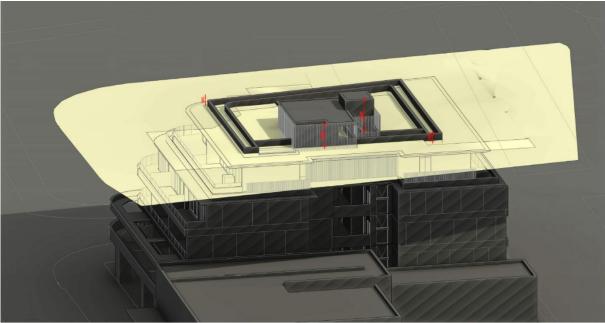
LEP Building height diagram (CD Architects, 20.3.2023)
